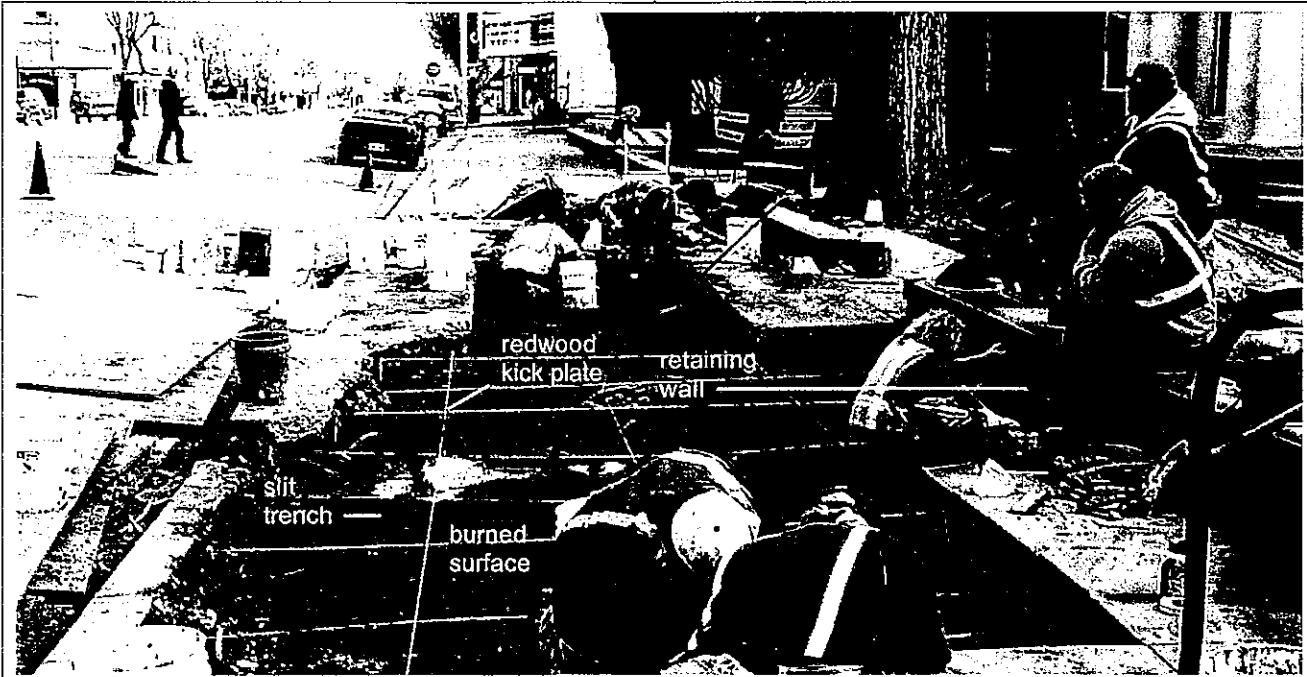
View looking east down the Market Street sidewalk showing the full excavation exposure, 1 March 2000.
